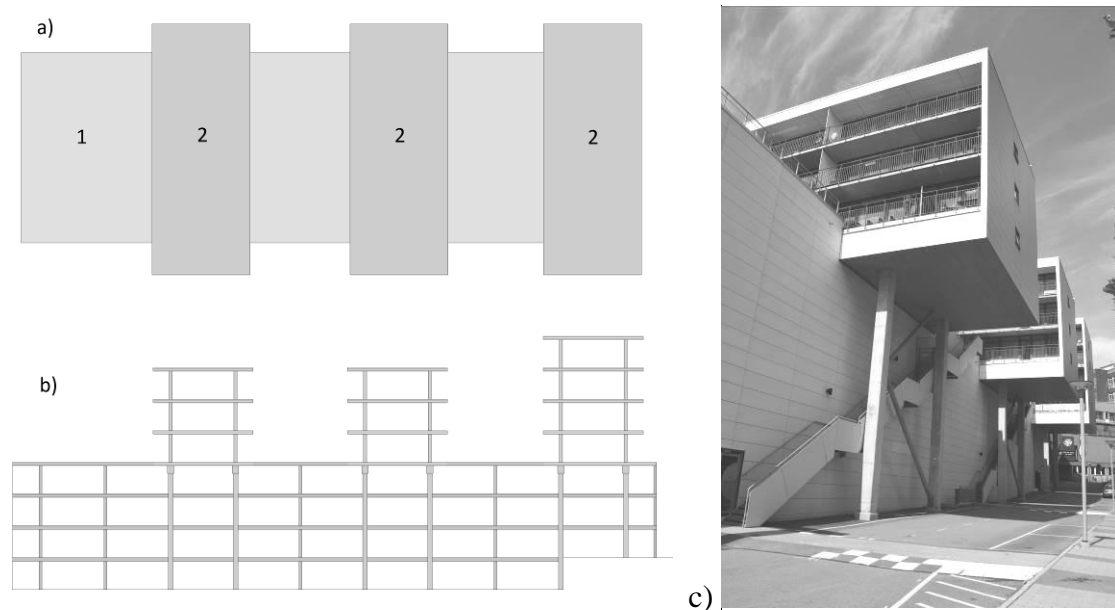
Structural system of Studio 57, a) overview from above where 1 shows the old garage and 2 shows the extensions, b) section in longitudinal direction, c) photo of the building with the new columns that support the extension.
